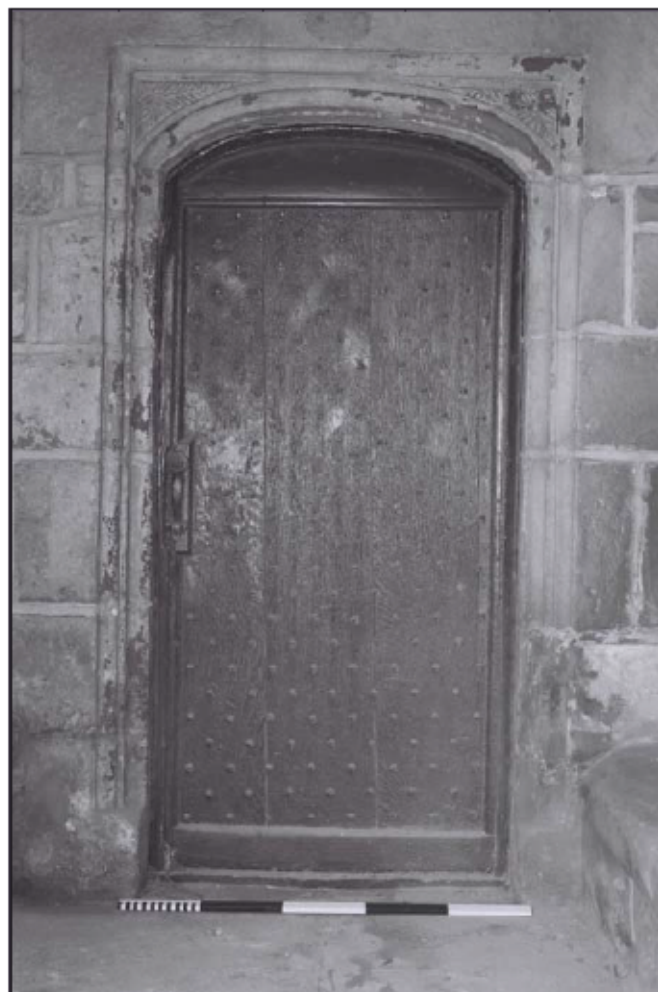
Detail of planked door with stone surround within porch (film 6.12)
